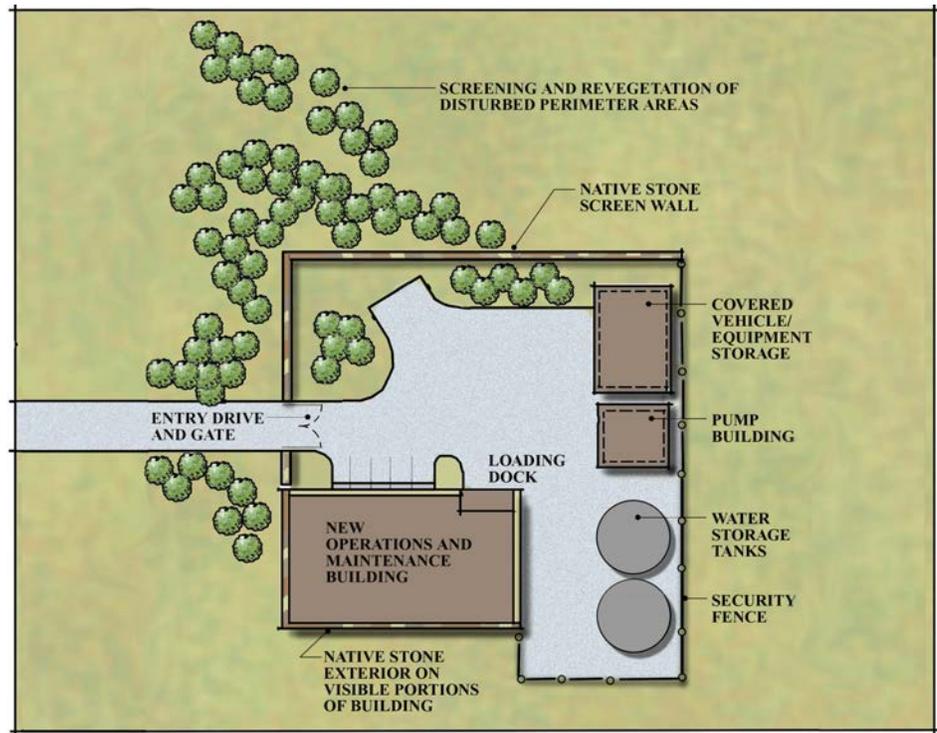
A: Conceptual Site Plan Park Operations and Maintenance Center
